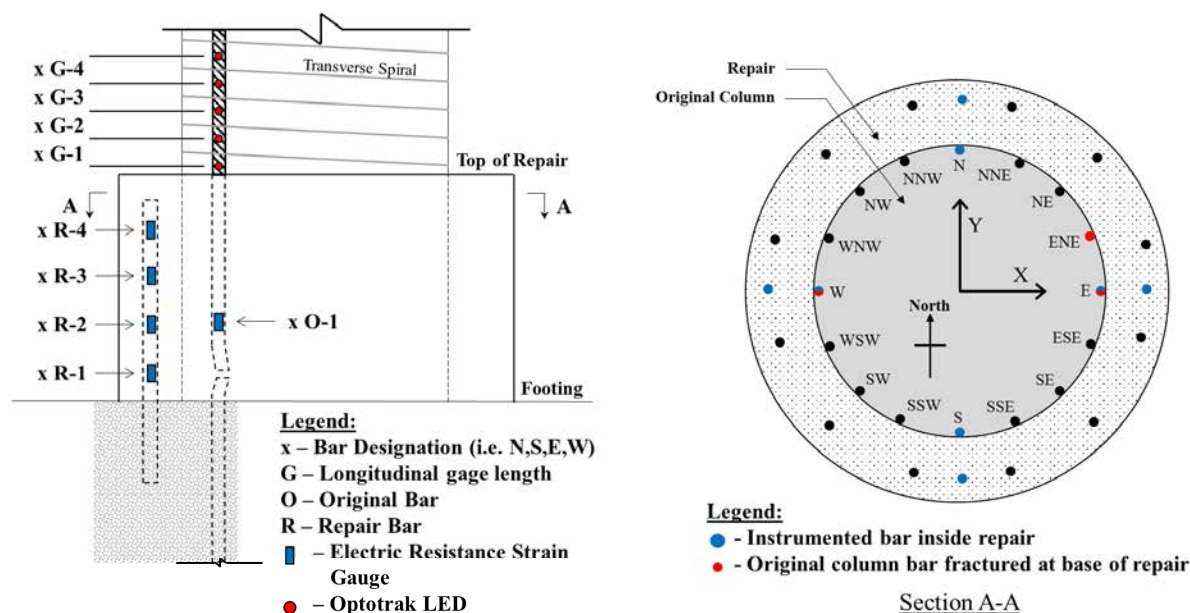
Repair #5 Instrumentation labels and repair cross section layout.
